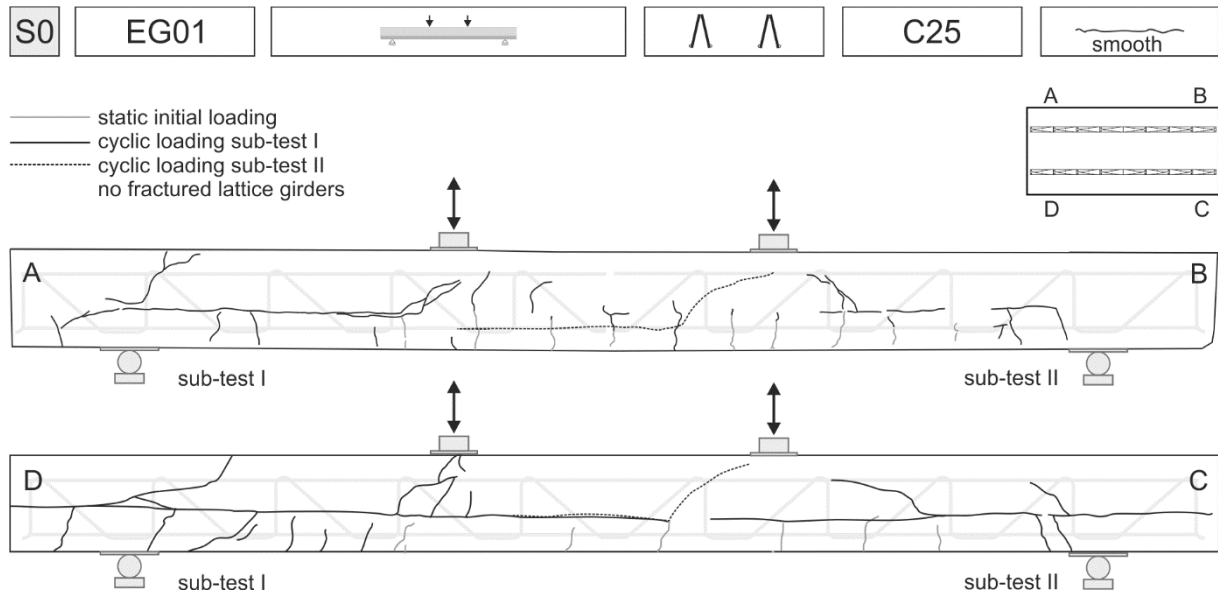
Test parameters, crack patterns and lattice girder fractures of specimen EG01
